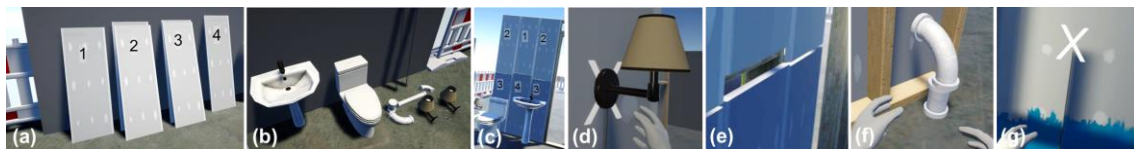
(a-b) Material sorted, (c-d) correctly installed by trades, (e-g) examples of observed quality issues, e.g. gaps in installed drywall sheets, misaligned pipe fitting, and lamp installation missing
